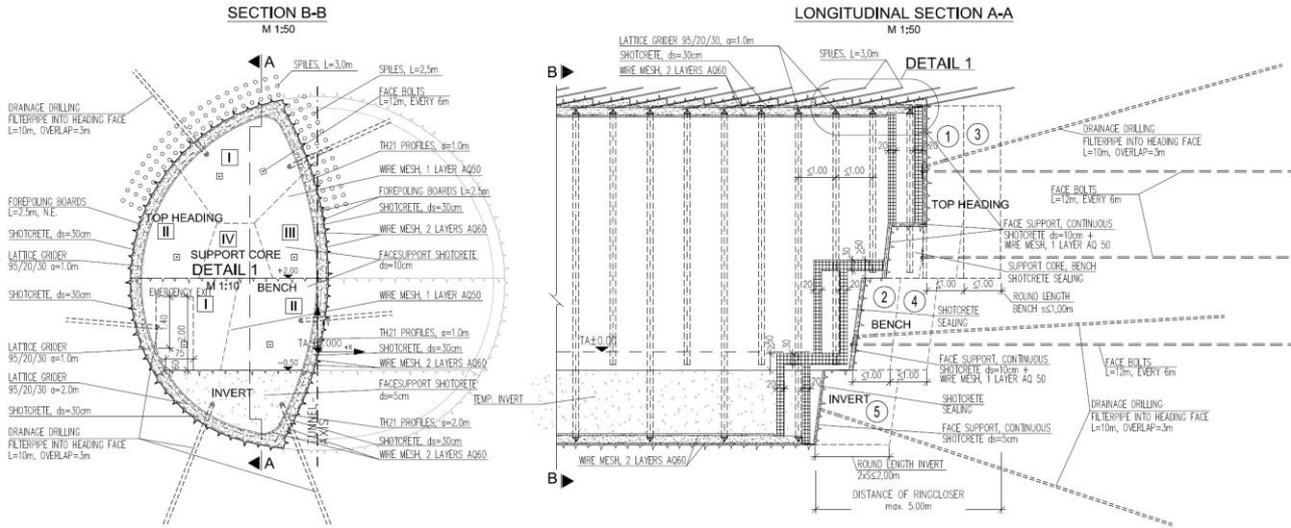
Outer lining and excavation sequence for platform tunnel / side drift
